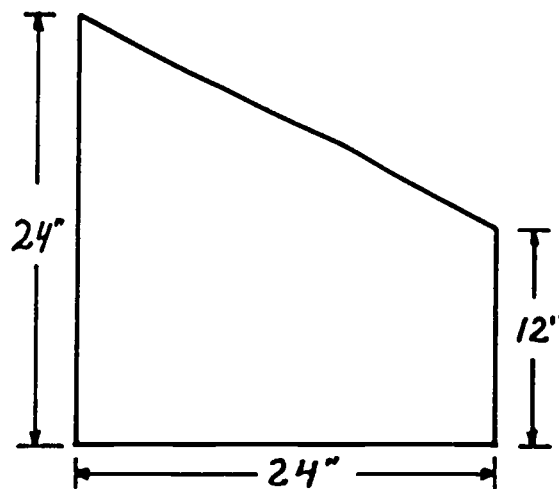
A-1. Building Felt Piece for Roof Truss Section of Short Wall
